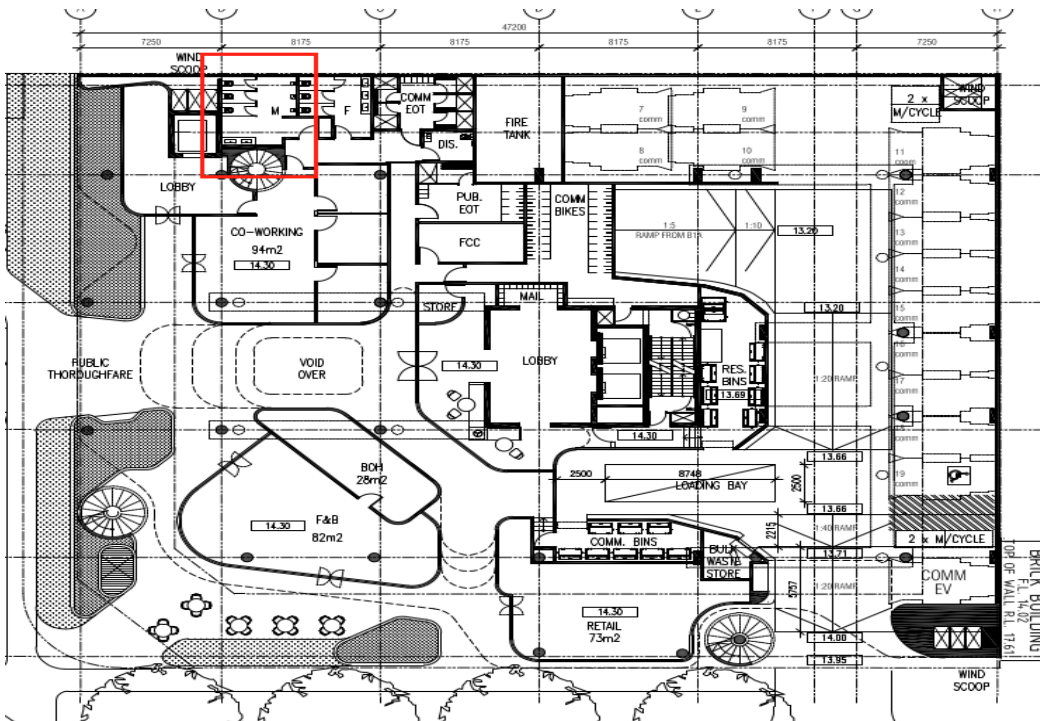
Current ground floor plan with addition of 3 male urinals as marked in red
